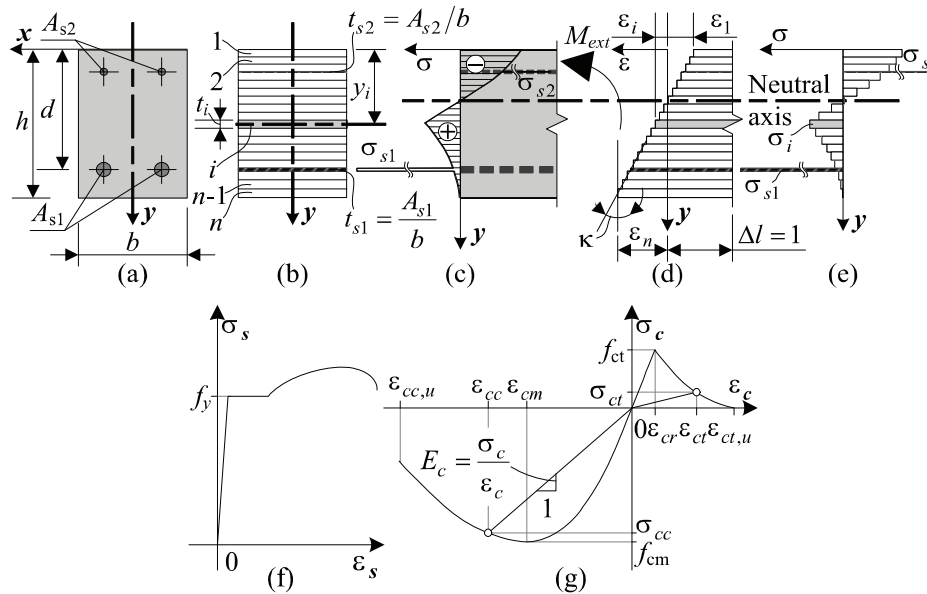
Layer section model of RC section (a)–(e) and a constitutive relationships for reinforcement steel (f) and concrete (g).
